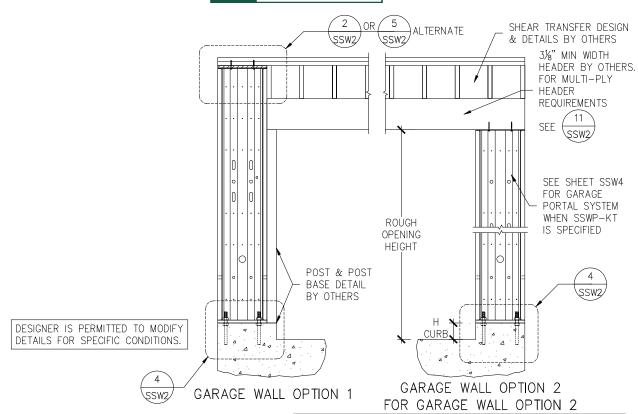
STEEL STRONG-WALL DETAILS (Continued) (4/SSW2)
